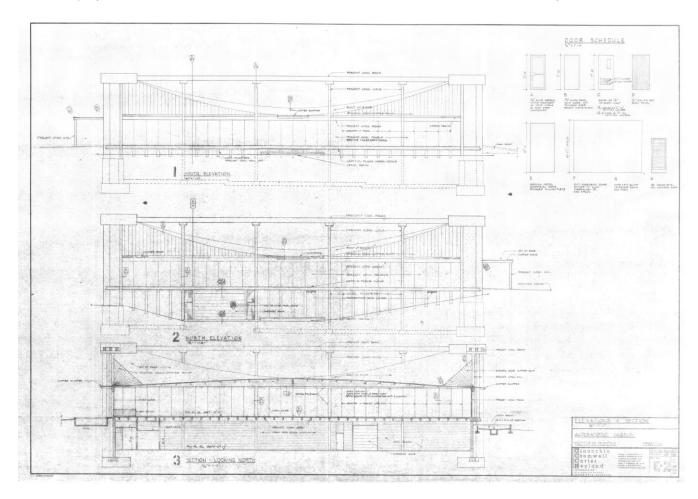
North and South elevation and Section plan for the Museum of Automobiles. From the files of the Arkansas Department of Parks and Tourism.
